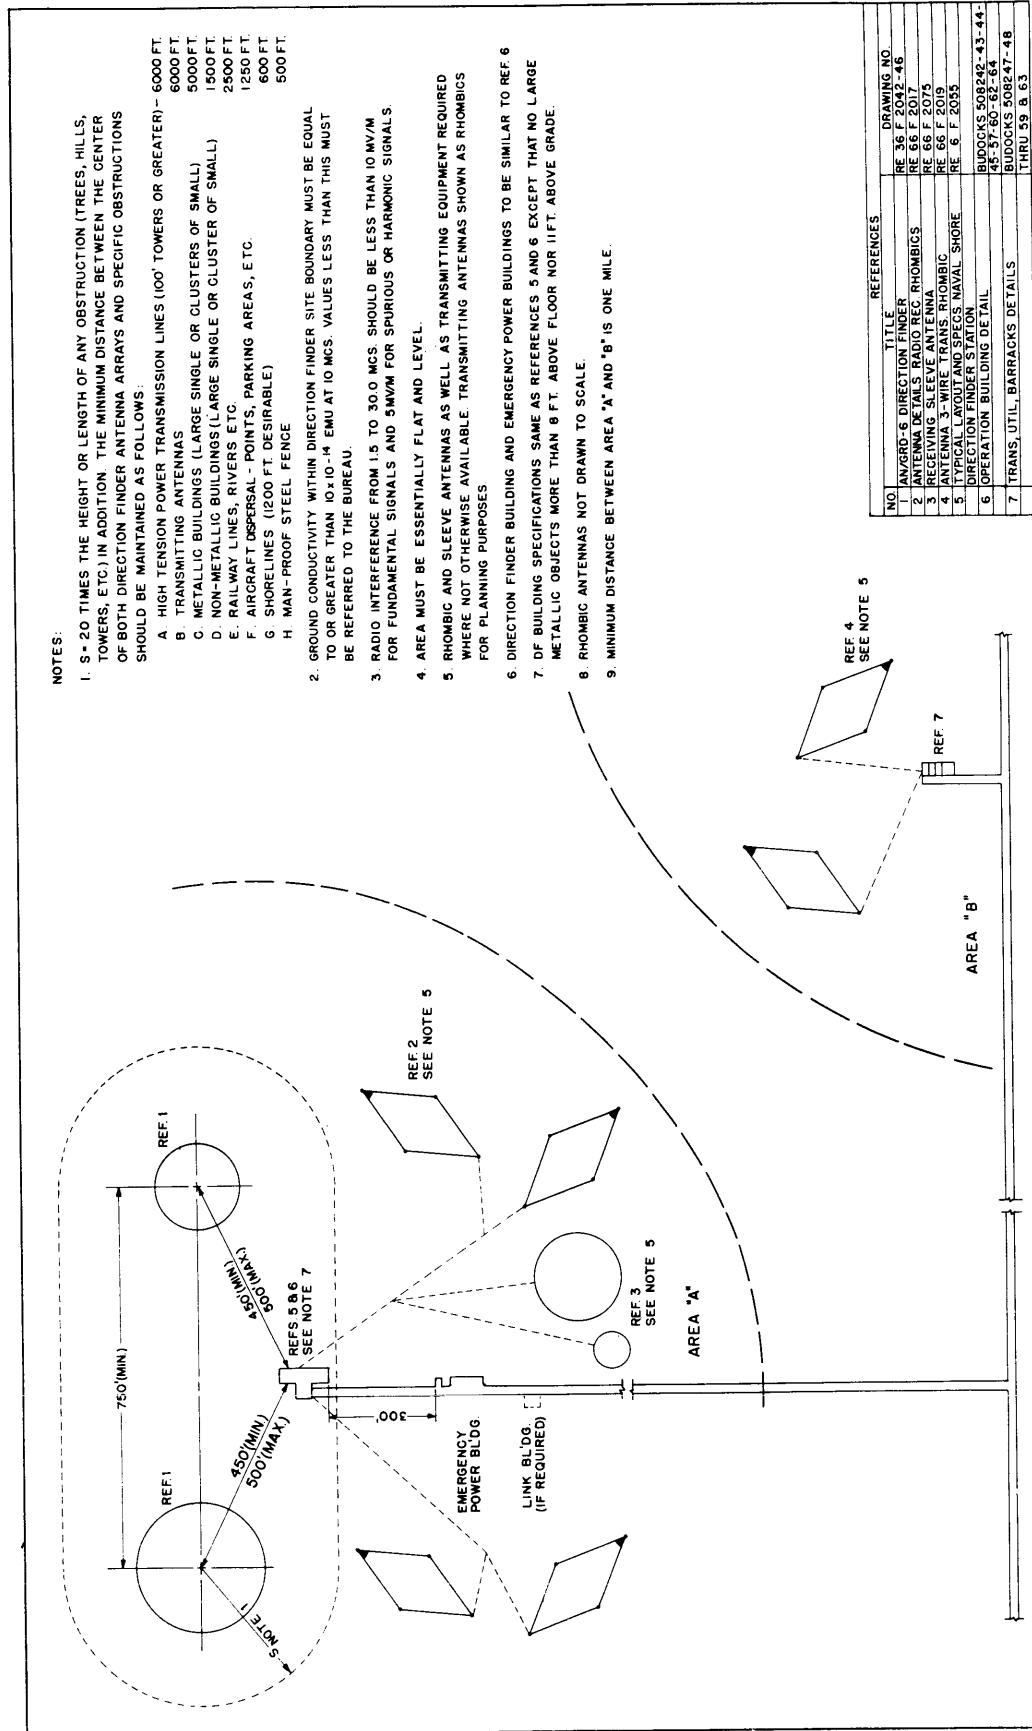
Typical Plot Plan for AN/GRD-6, HF Direction Finder
